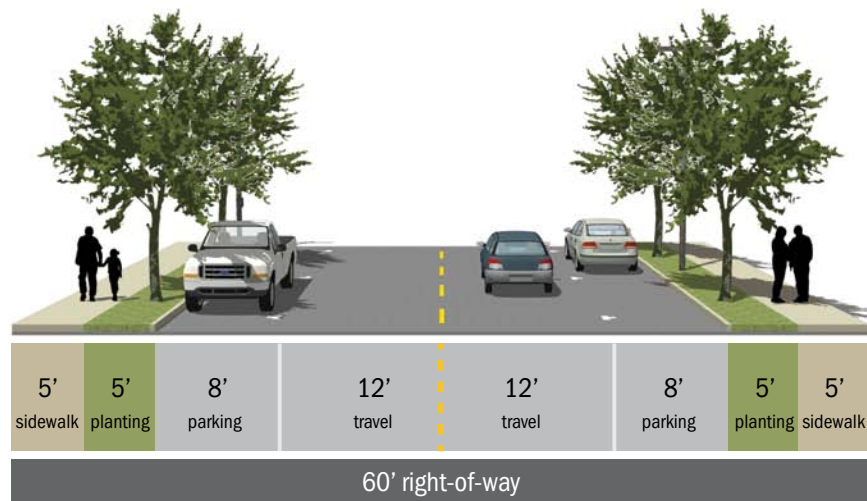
Proposed Conceptual Cross-Section for Local Streets with a 60' right of way
